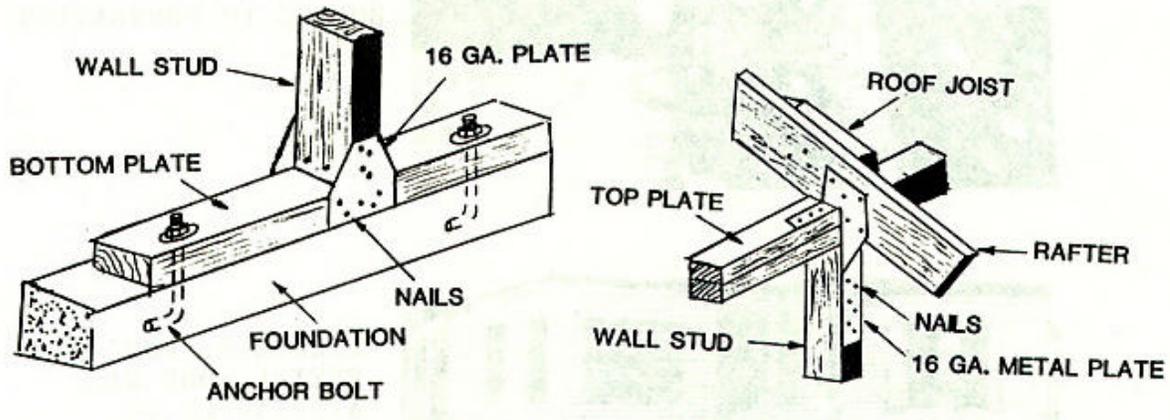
Recommended connection details to resist wind uplift: a) wall-foundation detail, and b) roof-wall detail.
